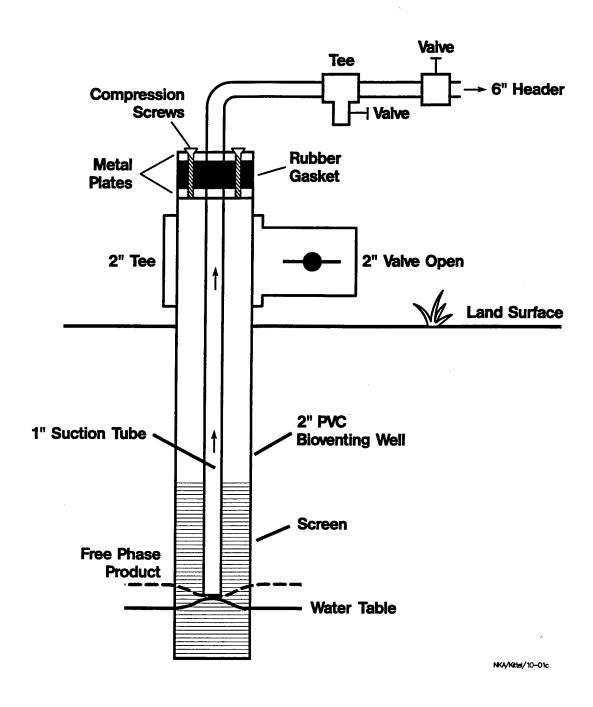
Slurper Tube Placement and Valve Position for the Skimmer Pump Test
